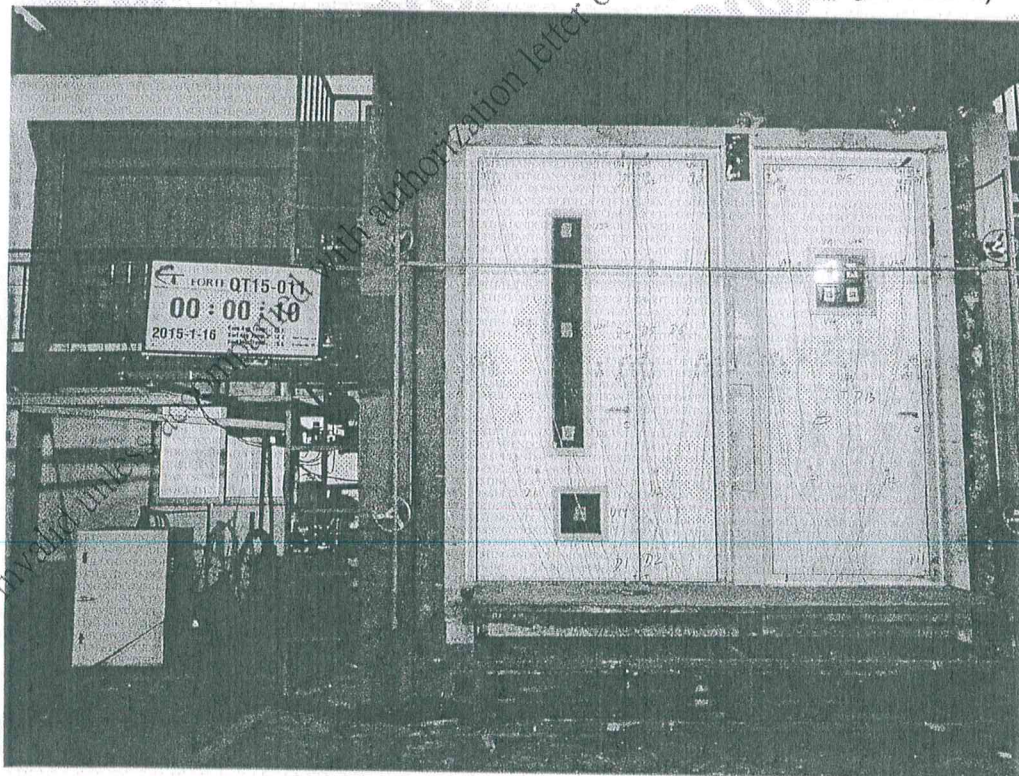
Unexposed surface of the specimen just after the commencement of test. (Left: Door A; Right: Door B)
